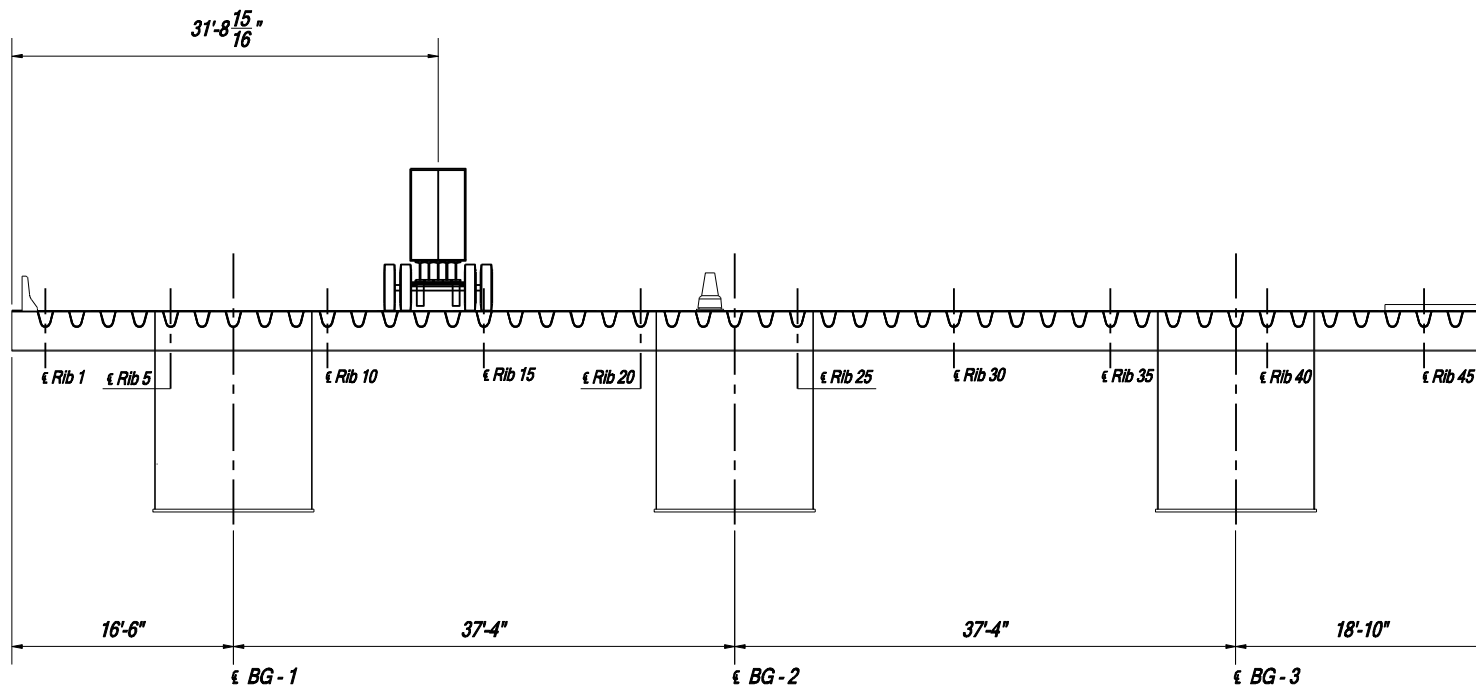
Transverse load position T34 considered for FEA of bridge deck
